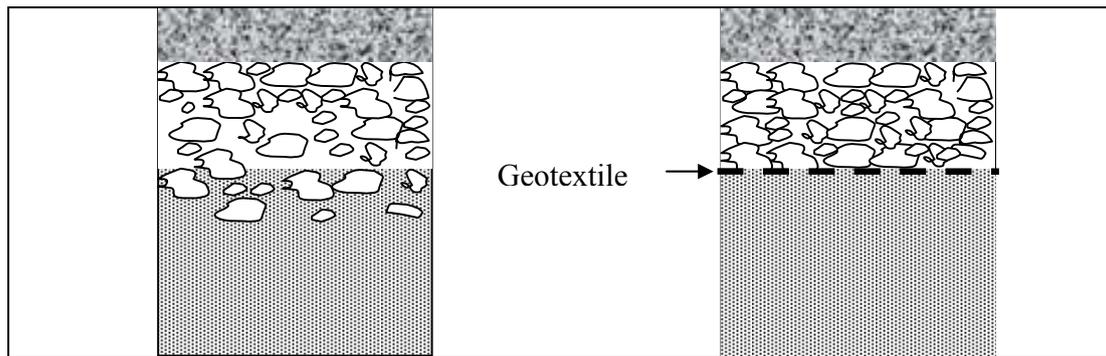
Stone Base Intrusion and Prevention in Roadway (after Rankilor, 1981)
